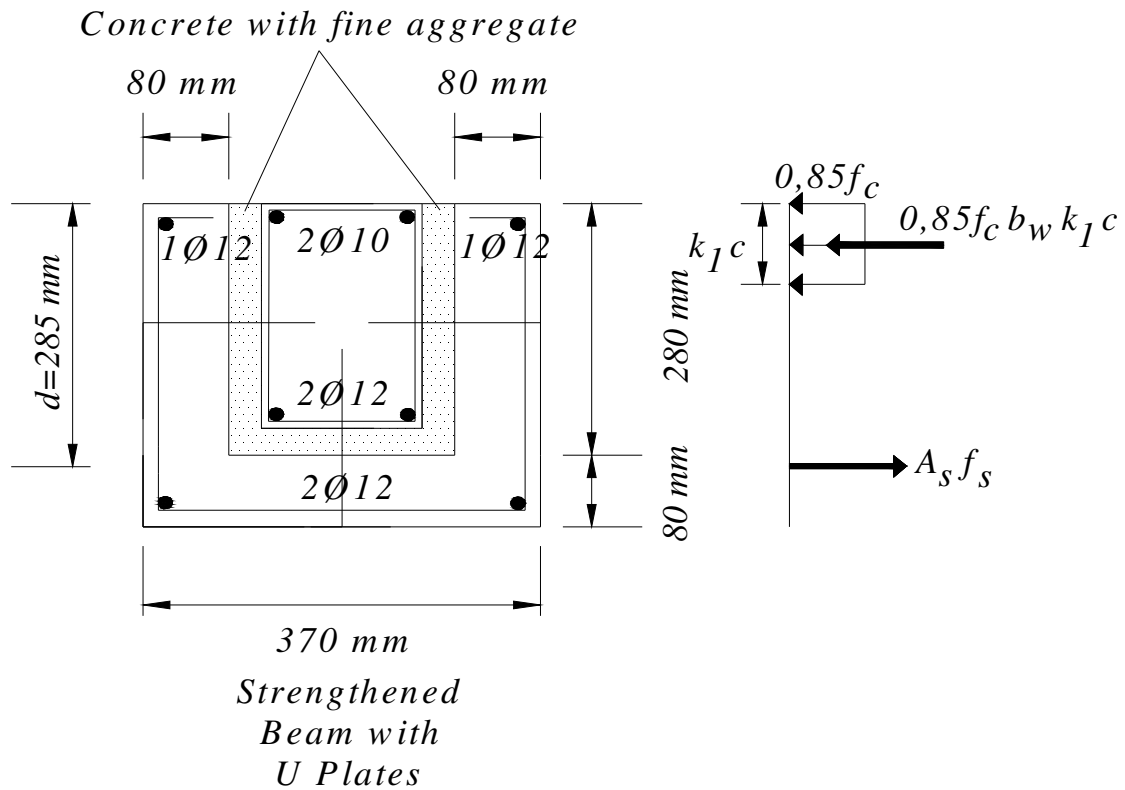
Finding of theoretical failure load for un-strengthened and strengthened beam with U cross-sectional plates.
